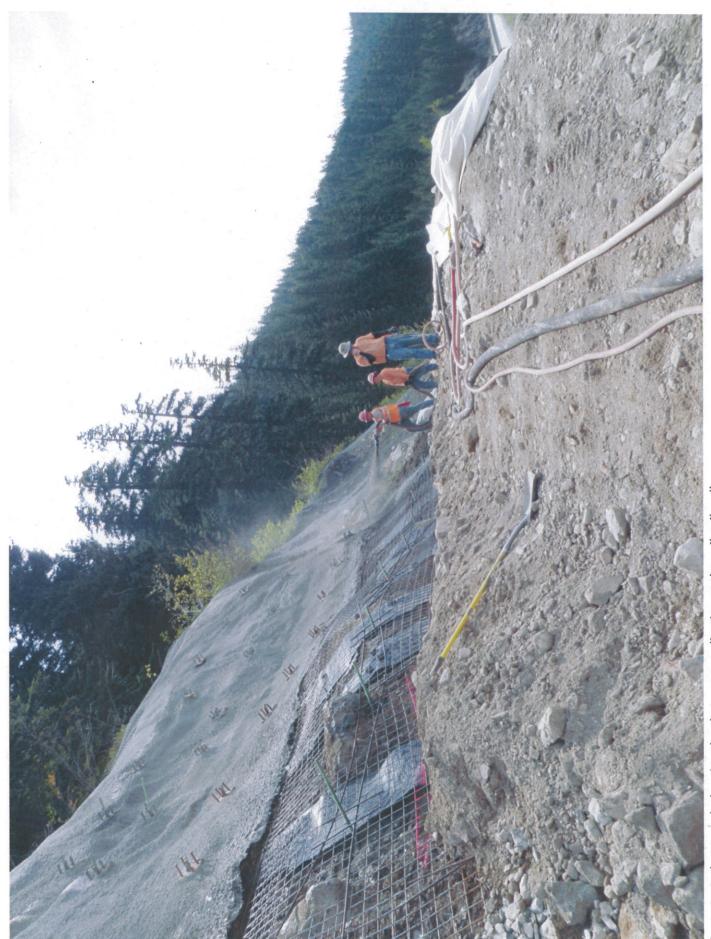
A photograph showing the shotcrete application at the soil nail wall.
